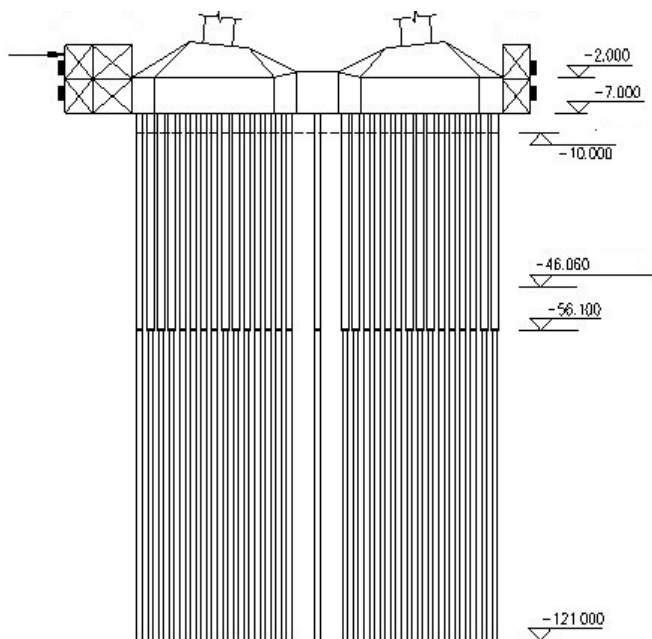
Construction of main bridge the South pylon pile group foundation (units:m)
